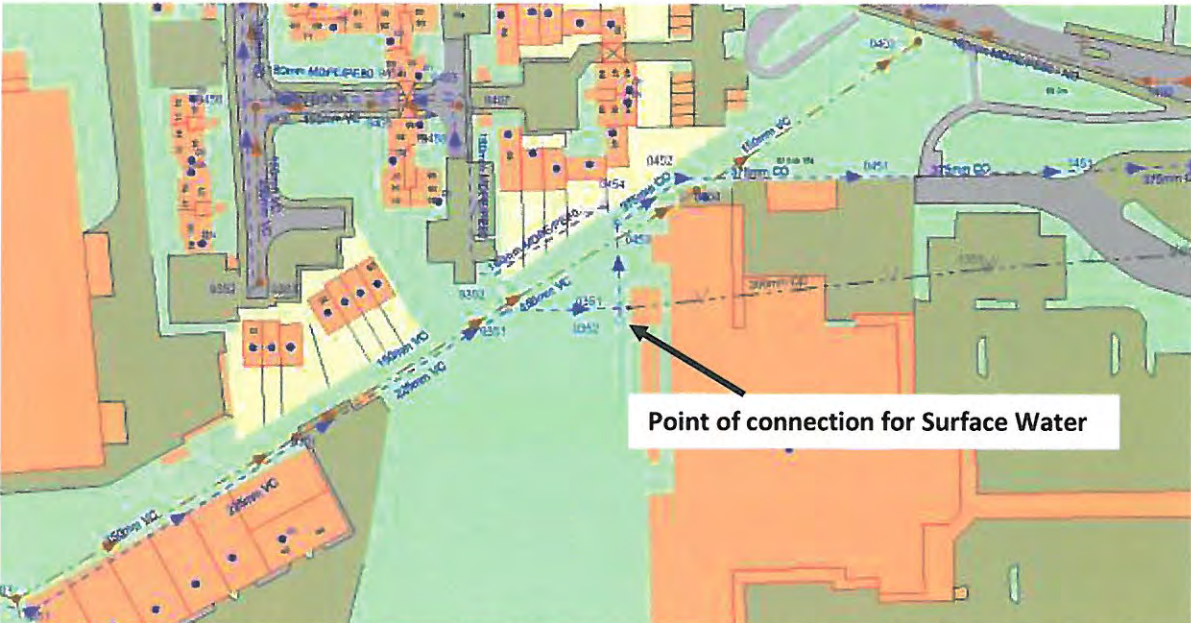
Showing your proposed surface water point of connection at manhole 0352 with a Cover Level of 73.371m and an Invert Level of 71.379m.
